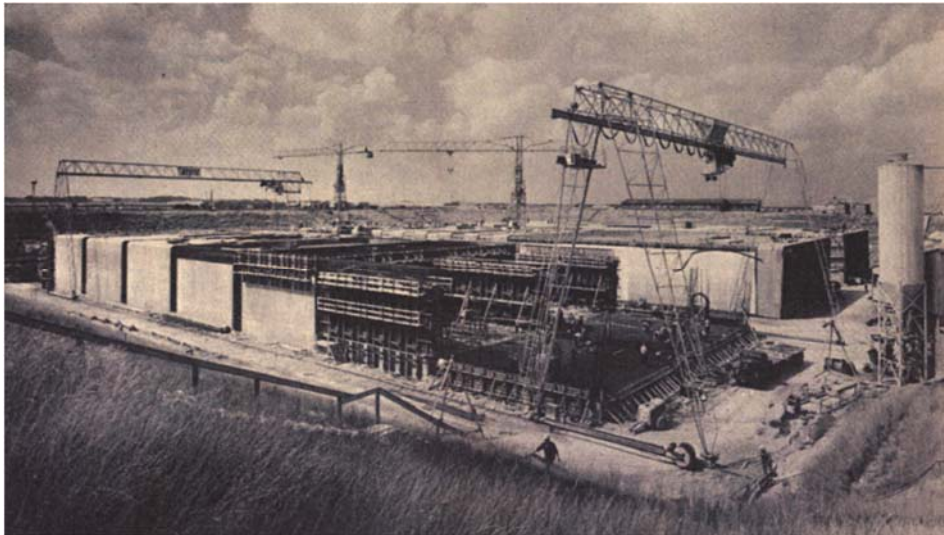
Casting of tunnel elements in the dry dock. The casting sections and openings can be seen on top picture.
